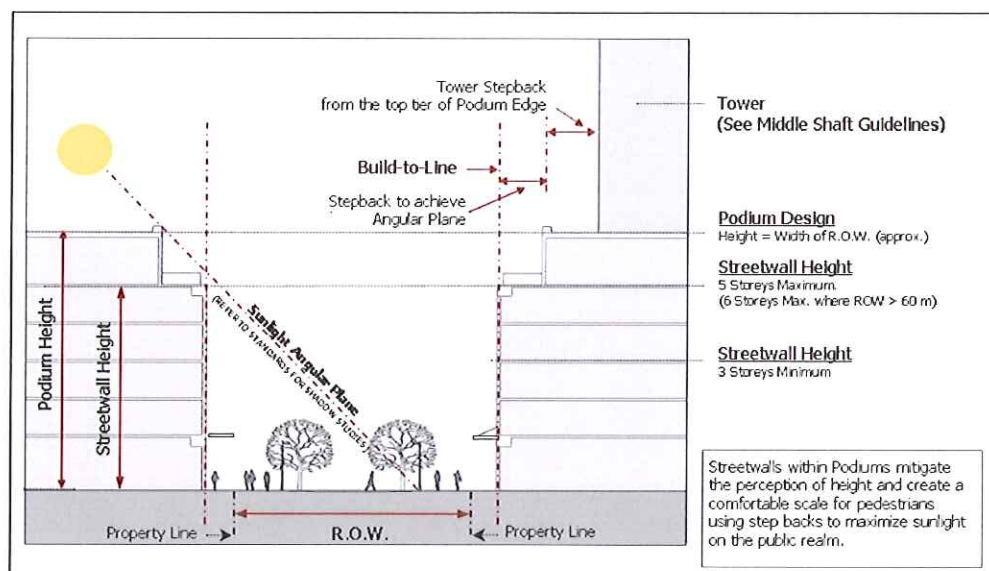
Podiums and their streetwalls will be designed with stepbacks at the upper storeys to provide light filled sidewalks and boulevards in the Downtown Core.
